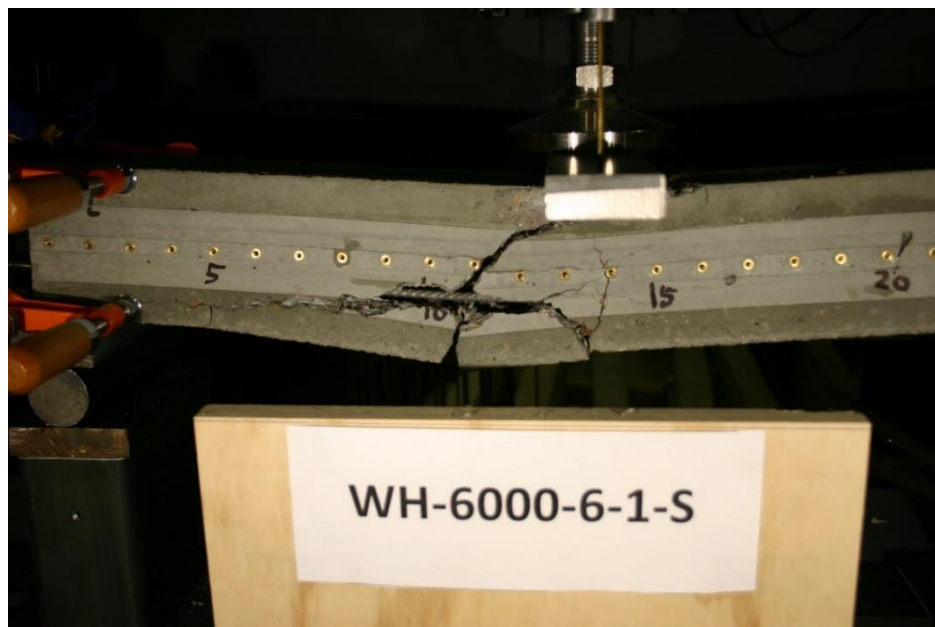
Picture of Failed Prism WH-6000-6-1-S
